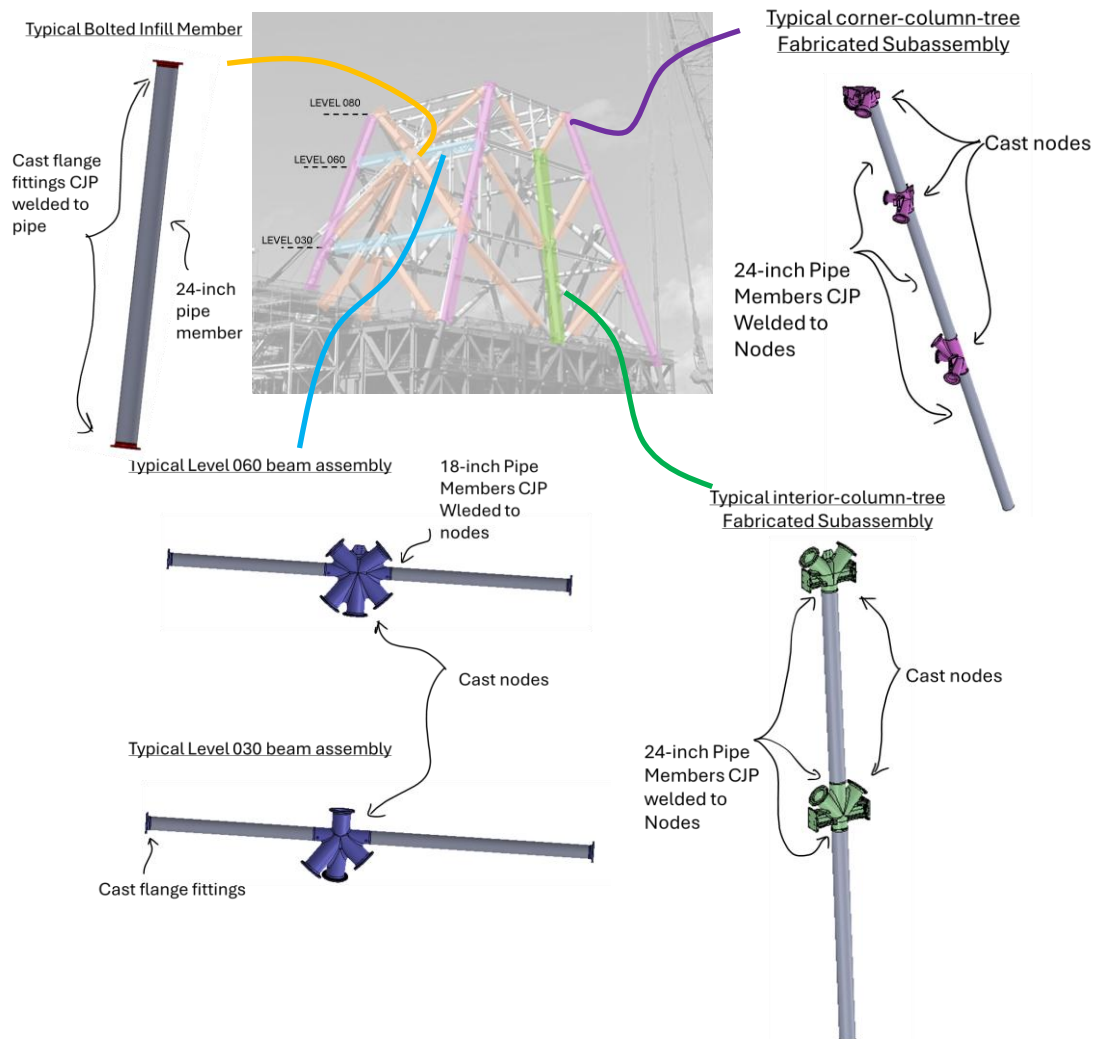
presents an overview of the typical fabricated subassemblies for the chair structure. The corner-column-tree assembly incorporated three cast nodes (level 30, 60, and 80 corner nodes) each, which were complete joint penetration (CJP) shop-welded to the adjoining 24-inch diameter pipe members.
